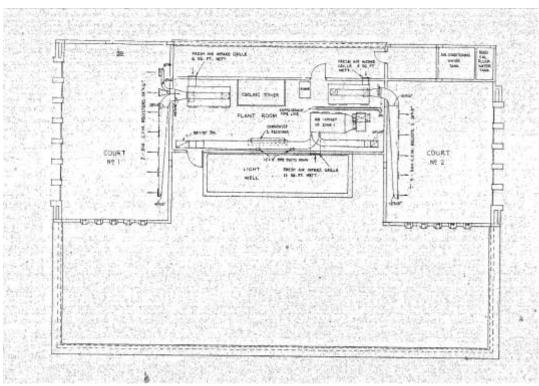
Roof Floor Plan with BS installation (1959)
